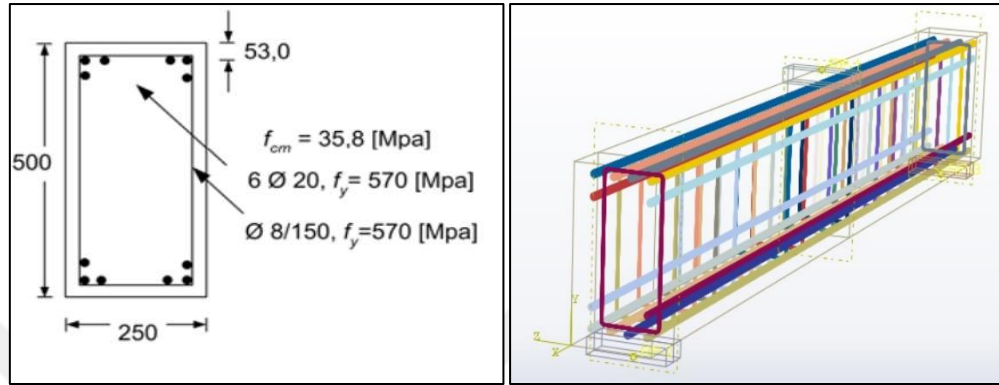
Reinforced concrete beam details, Mark 2004[57]
